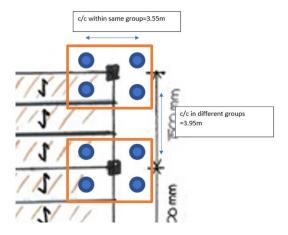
Spacing of piles in the same group, and the spacing between neighbouring groups
